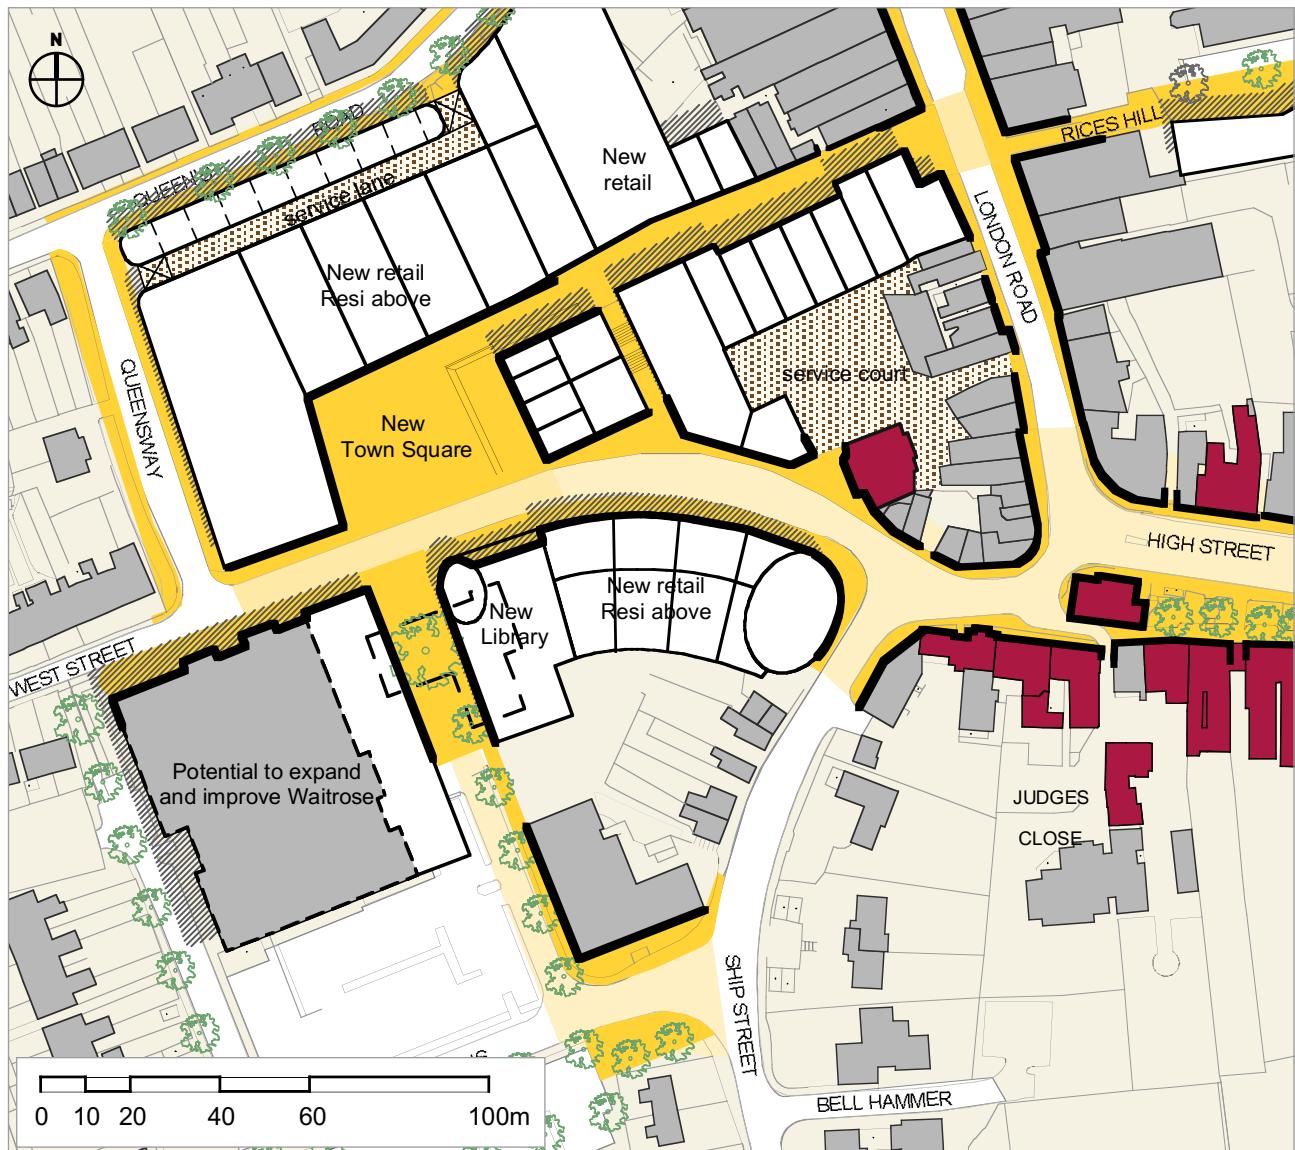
Masterplan detail: Queens Walk redevelopment area.
